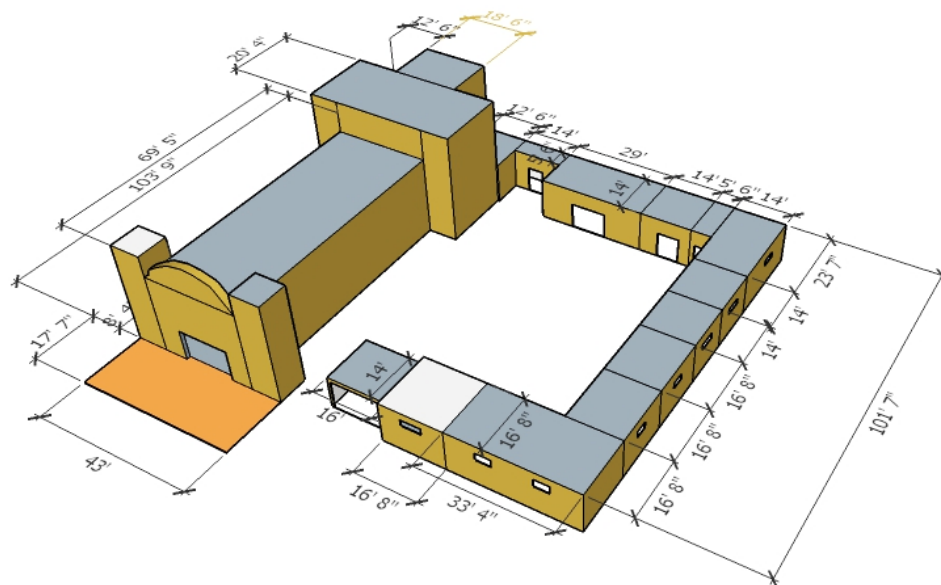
Sketchup drawings of 1795 floor plan (missing bell towers and other architectural elements).
